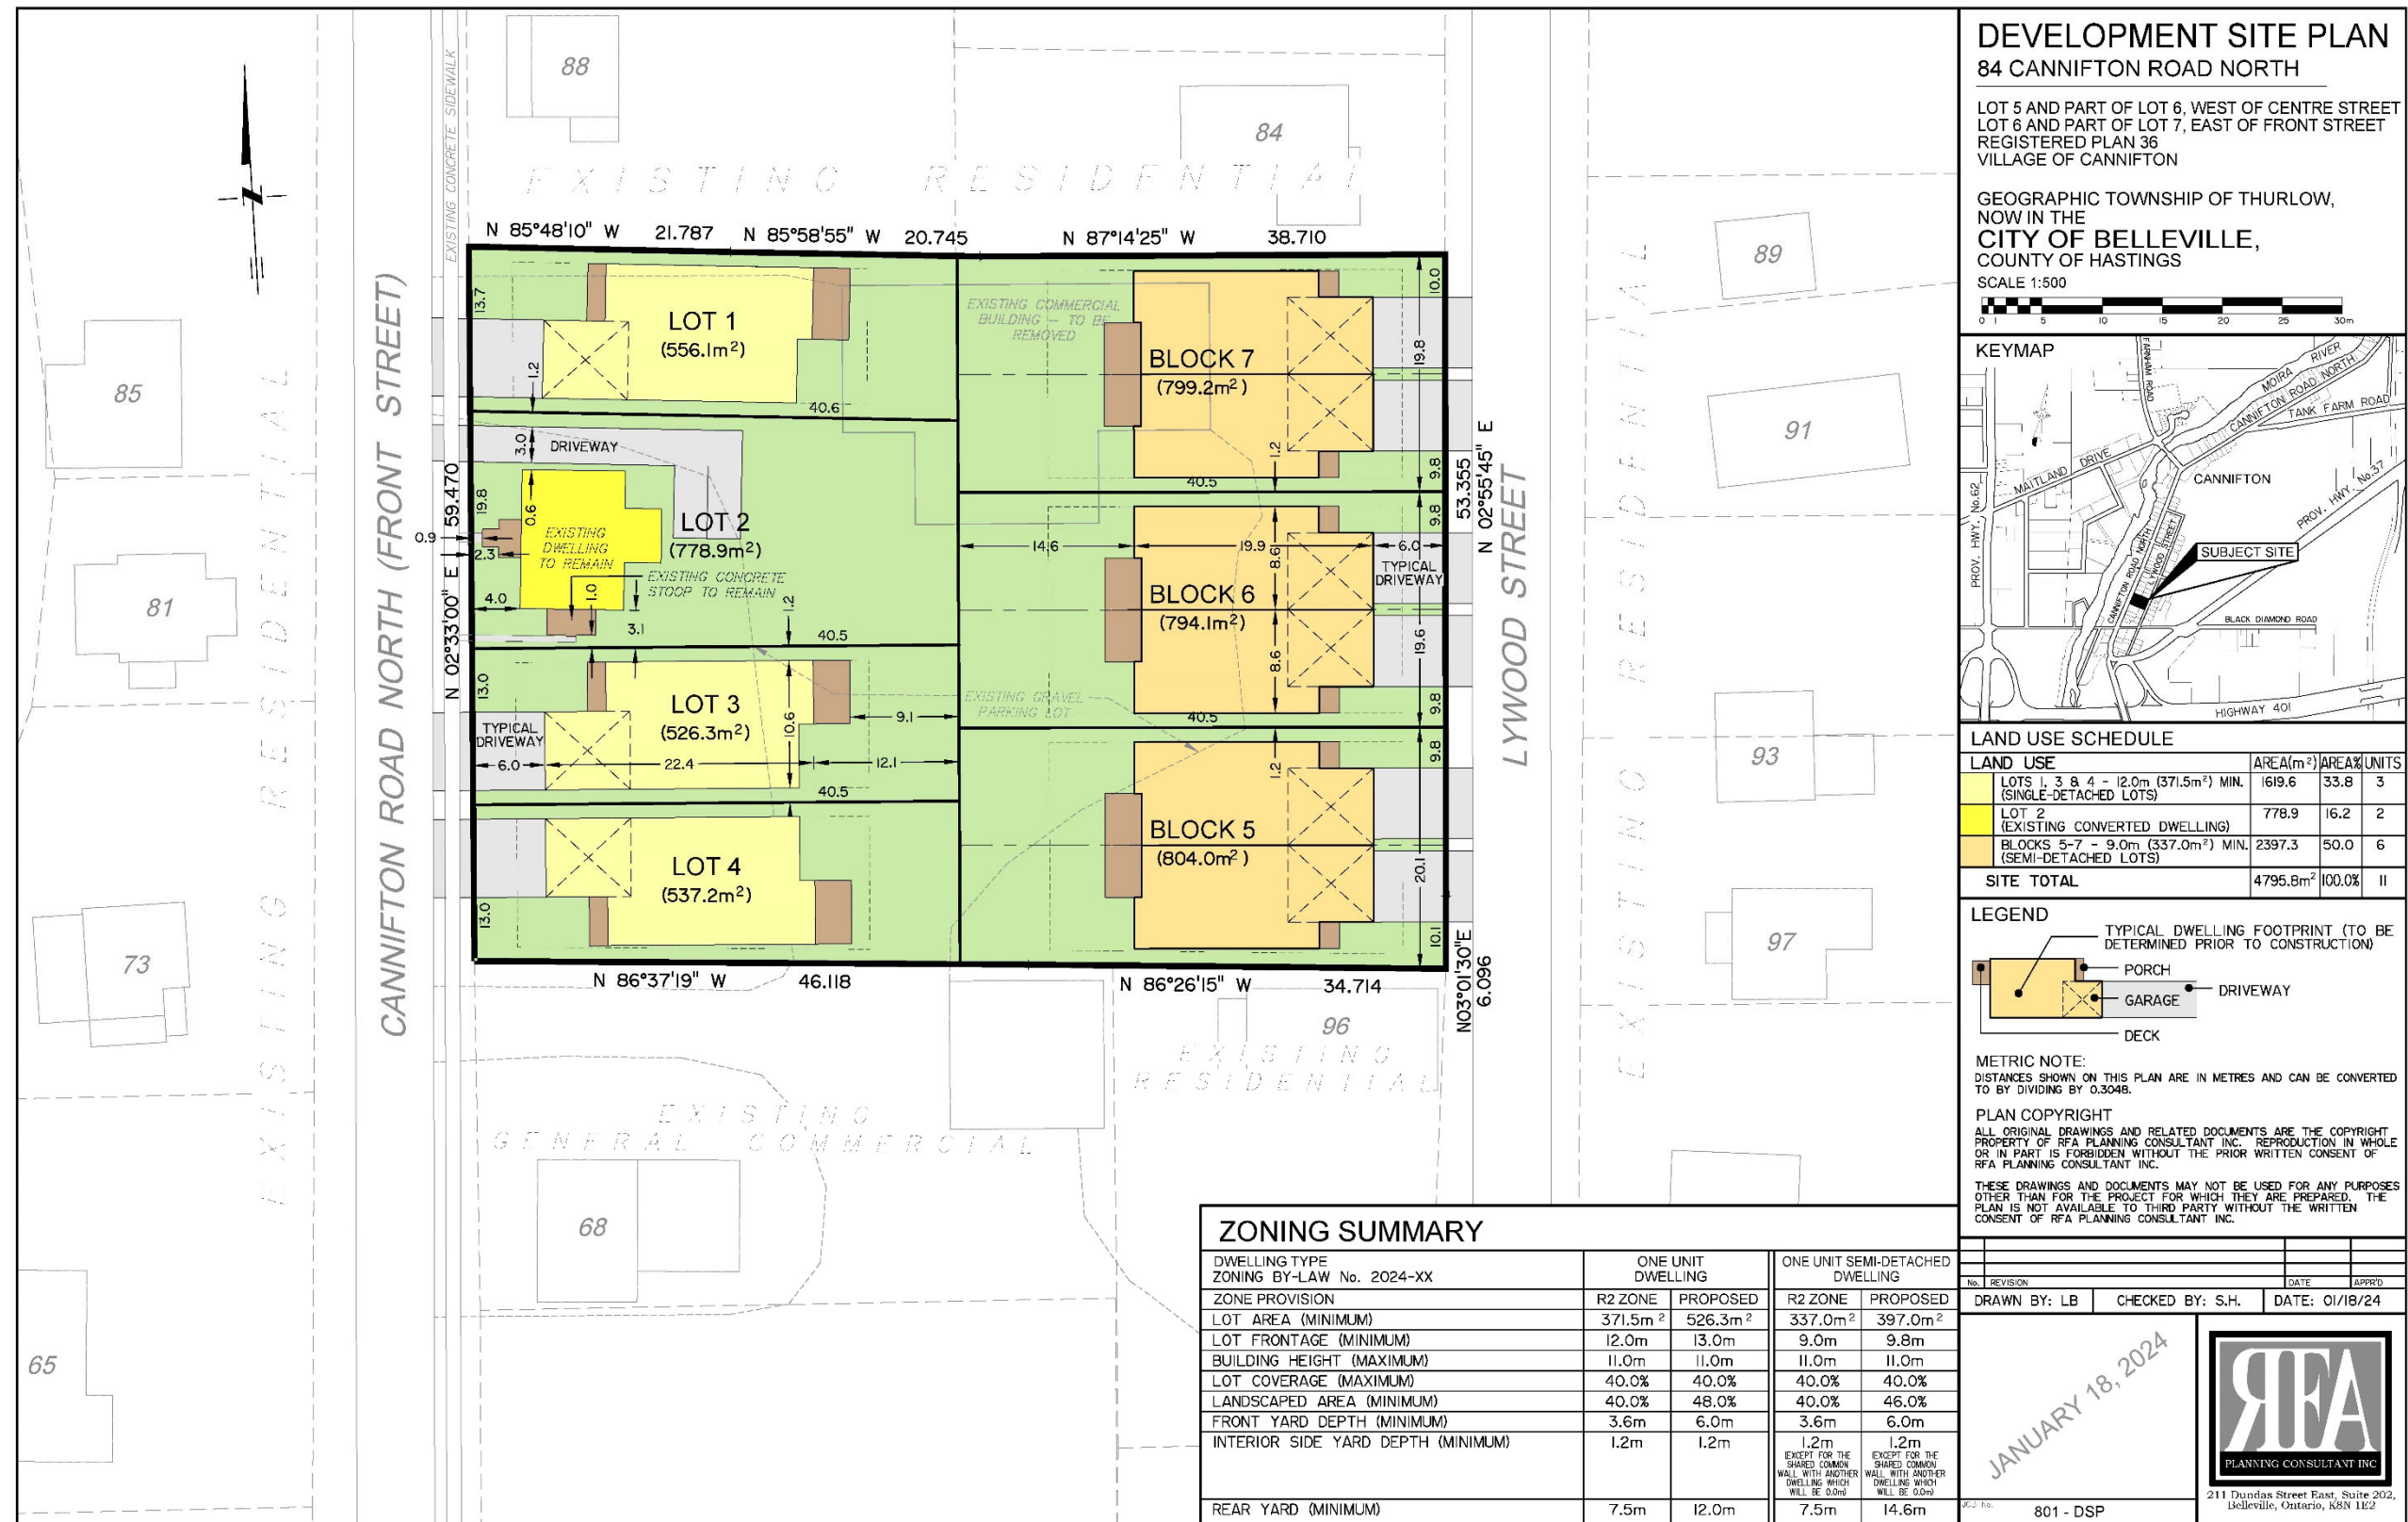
Concept Plan, on the following page, illustrates the proposed land use and provides a zoning assessment. It demonstrates the built form of the development, including the mix of dwelling types. The building footprints shown on the Concept Plan illustrate the typical buildings proposed; the actual building plans are subject to change. A sidewalk will be located across the frontage of each lot.
